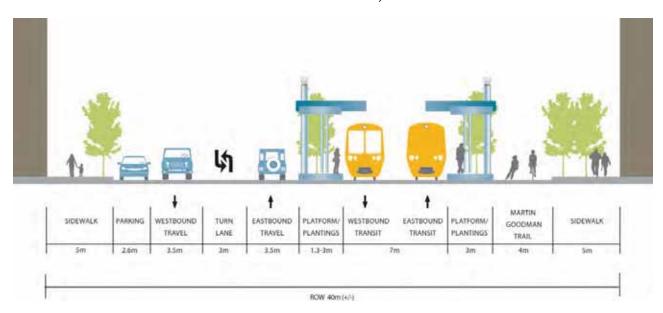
Cross-section for Queens Quay between Parliament Street and Cherry Street (facing east)
